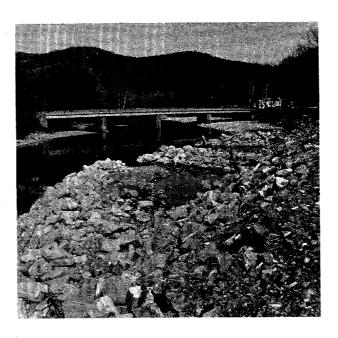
Rock spurs, inclined downstream. (Lycoming Creek, Pa.; Site 43.)
